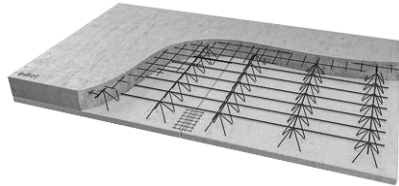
Semi-precast (filigree) slab (InBet Sp. z o.o, n.d.)
